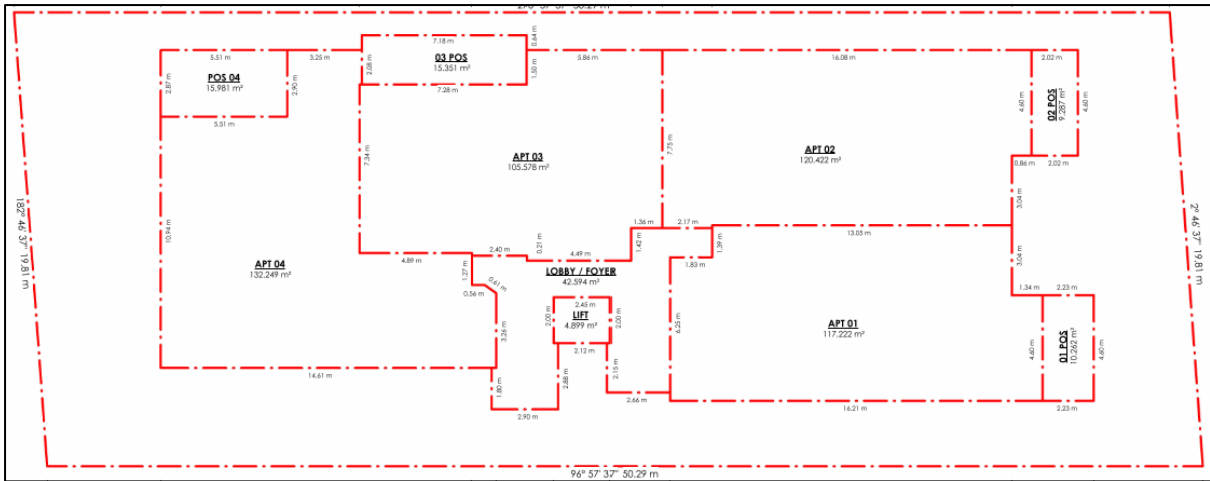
(Above) Proposed ground floor plan of subdivision. Source: Application documents.
